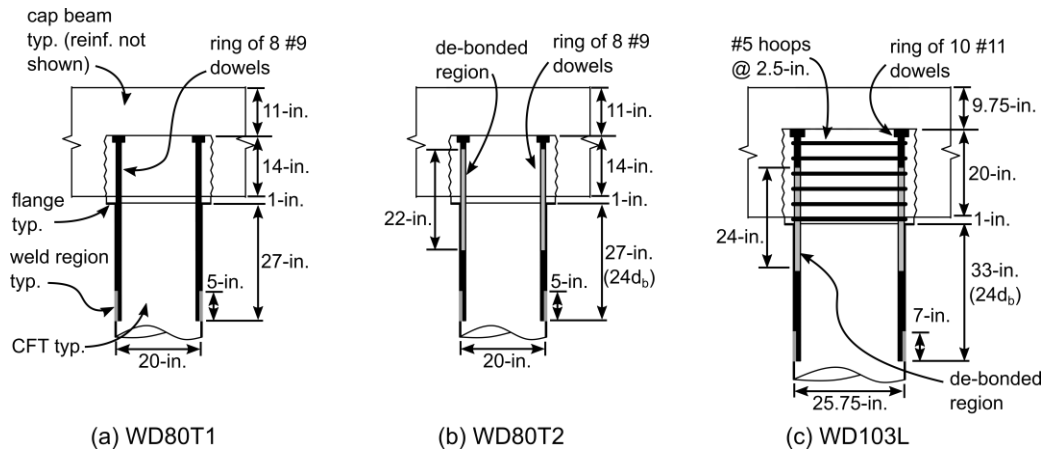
Connection Details for Welded Dowel Connection Specimens
